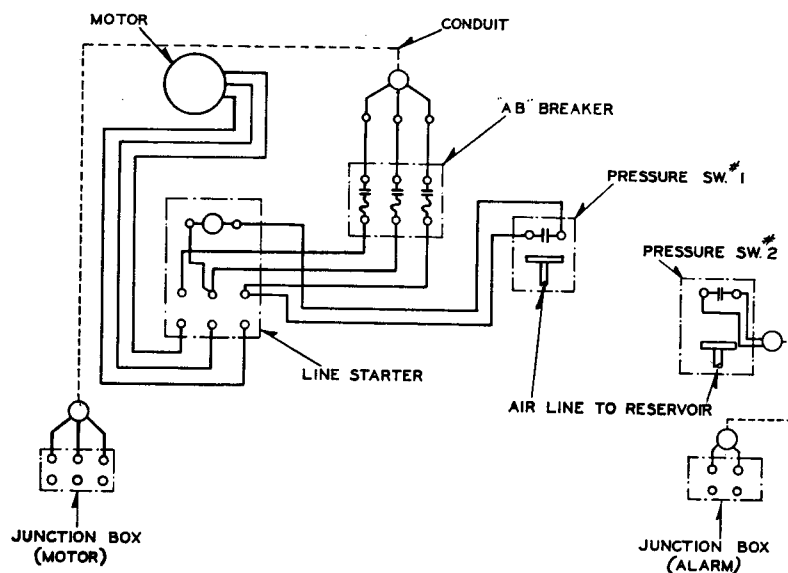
WIRING DIAGRAM FOR SINGLE COMPRESSOR UNIT
